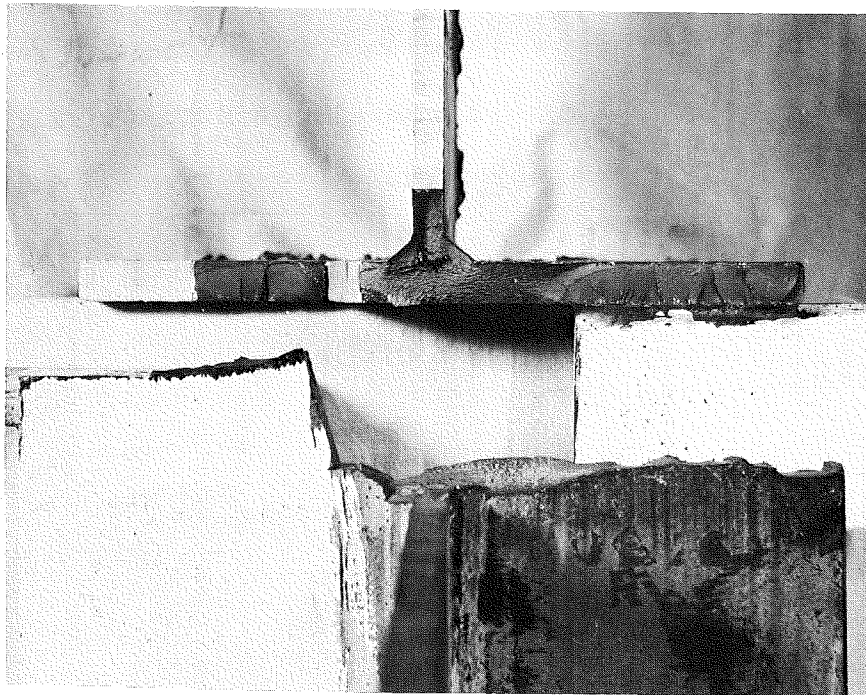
Fatigue Crack at Short (1/4 in.) Attachment to Flange
